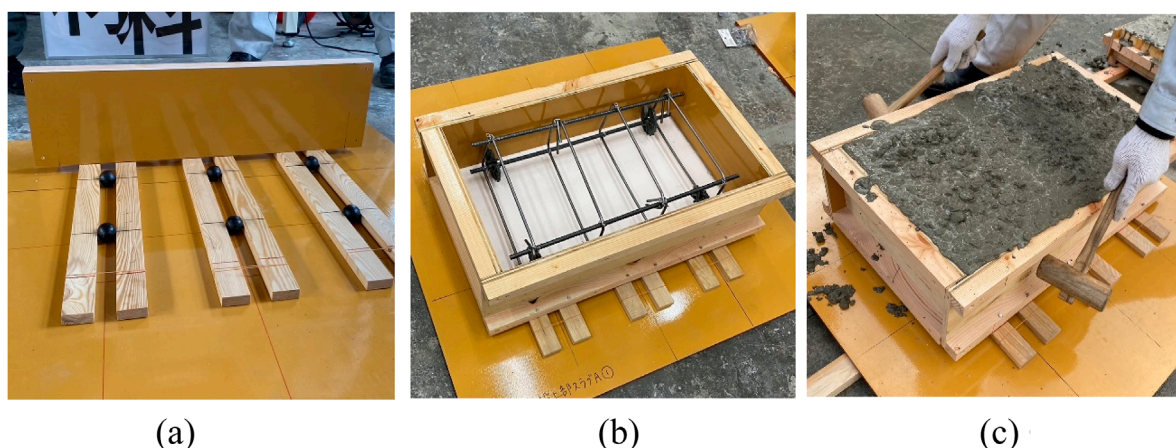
Construction procedure of upper slab. (A) Placement of cast-iron balls. (B) Reinforcement. (C) Casting concrete.
